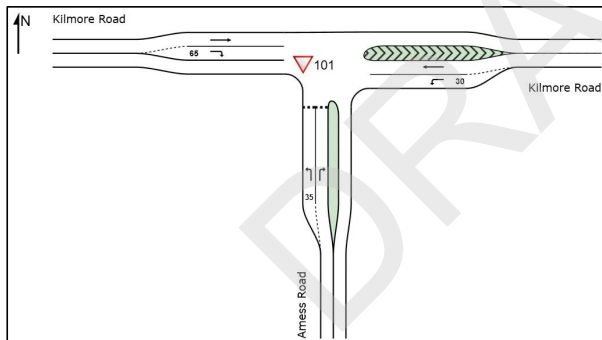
Modelled layout of Consultant 1's proposal at the intersection of Kilmore Road and Amess Road (option 2)
